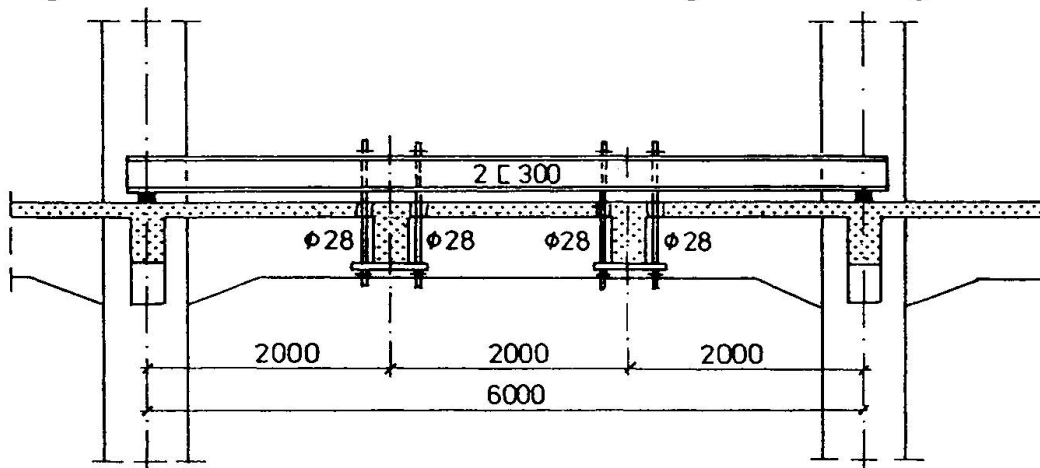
The method of suspending of secondary beams and unloading the stay ropes
